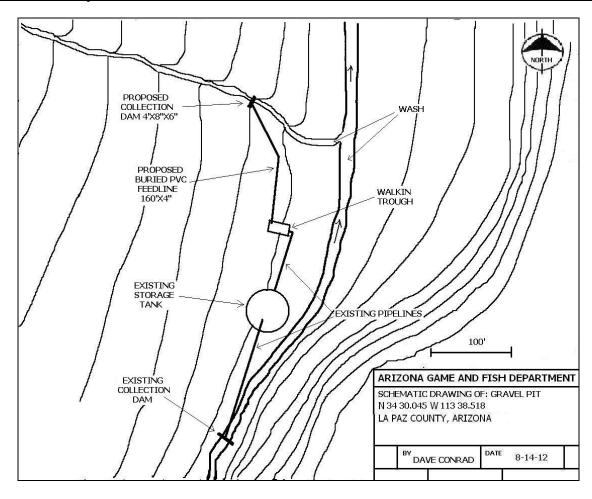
Gravel Pit development showing proposed collection dam and feed line.
